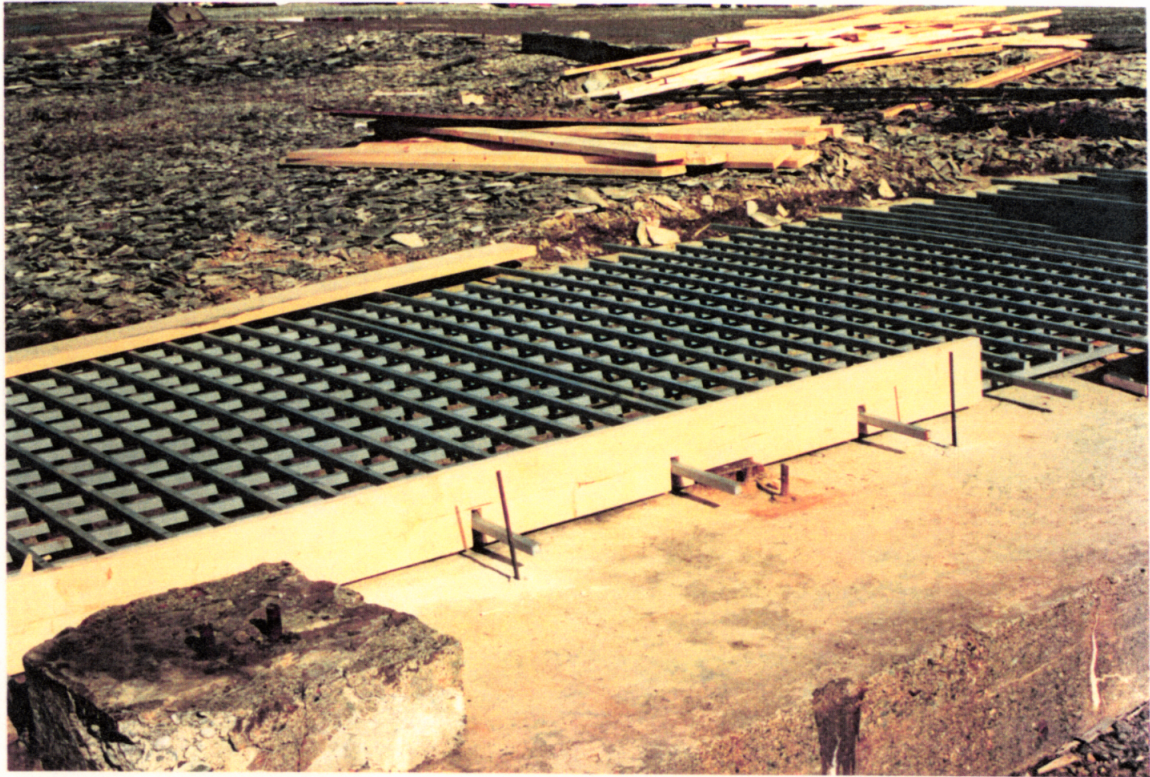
Initial construction of forms showing grate anchoring bars and rebar dowels.
